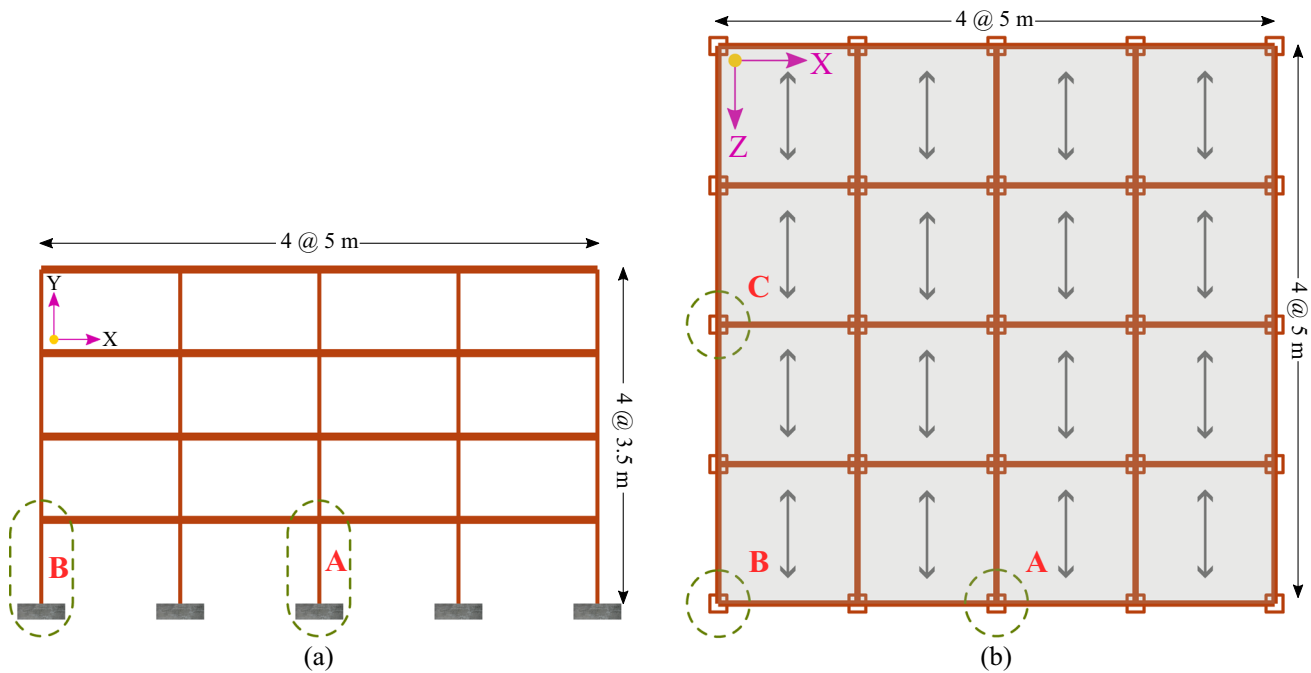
Model structure and initial failure cases; a side view and b plan view
